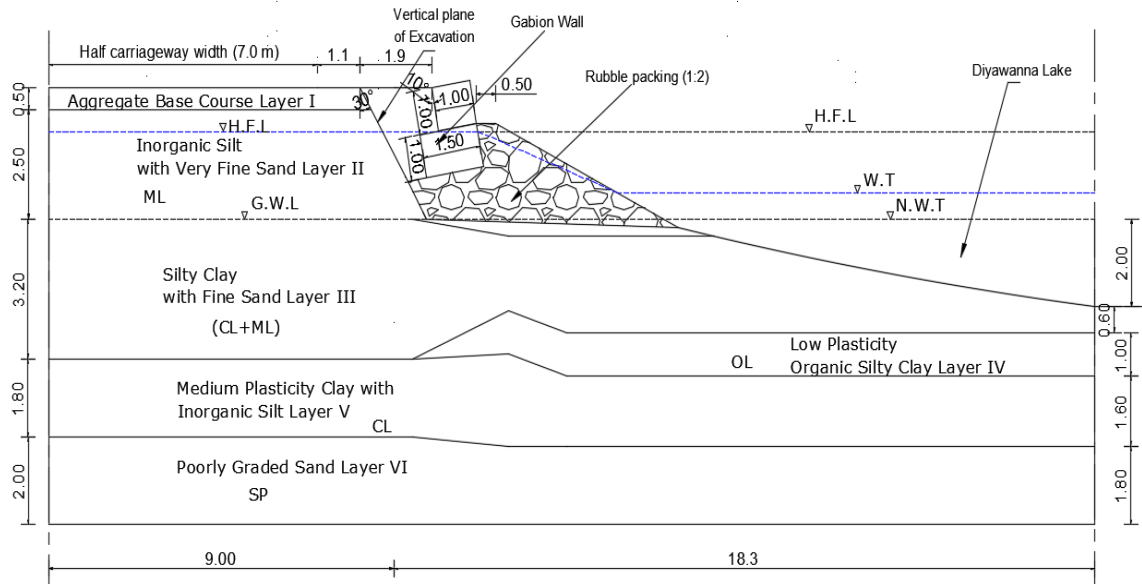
Proposed Gabion Wall section with Rubble packing at the toe
